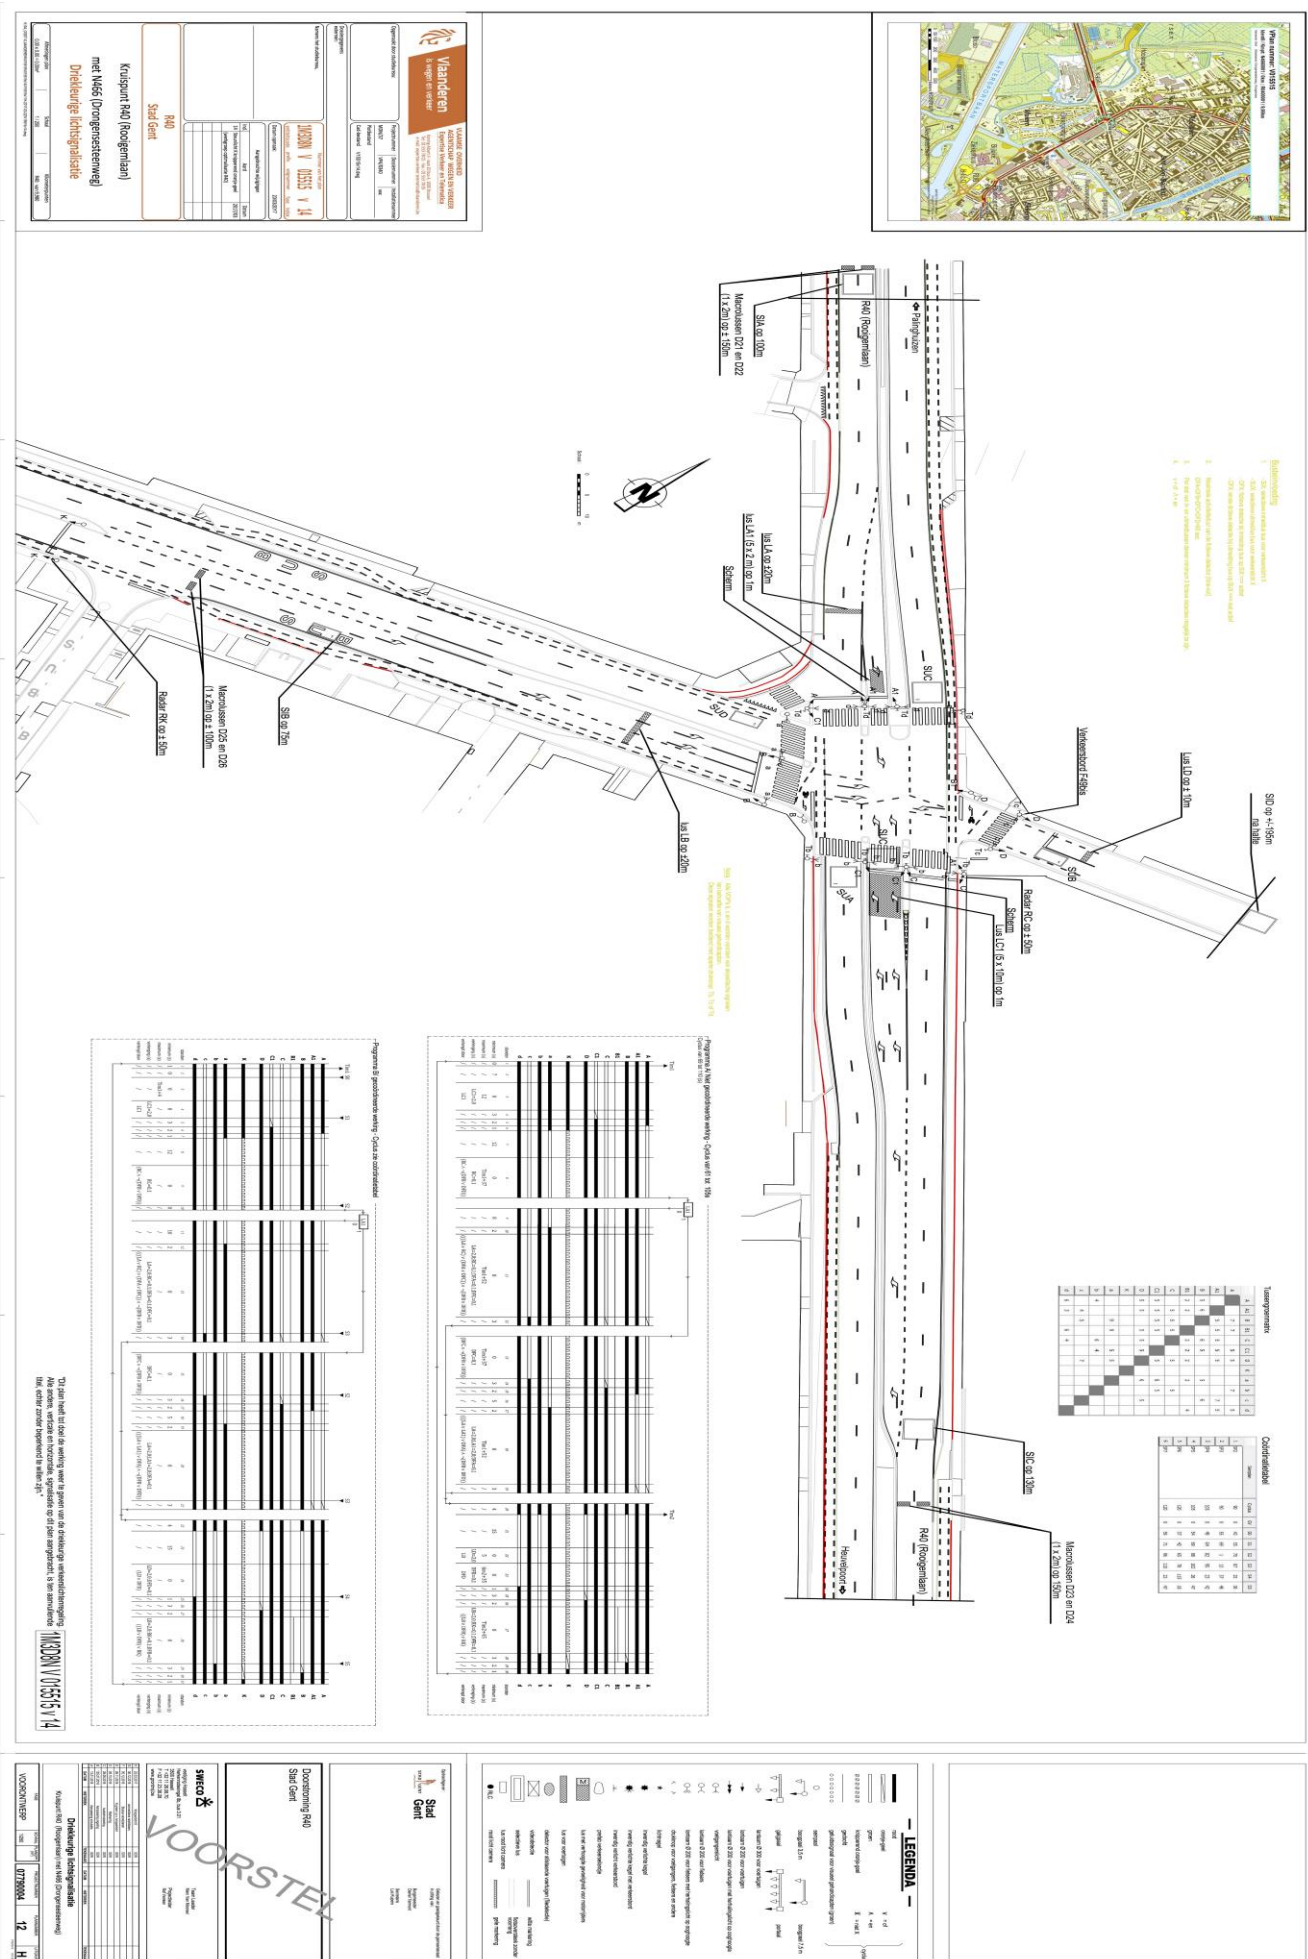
V-plan: Intersection Rooigemlaan and Drongensesteenweg
